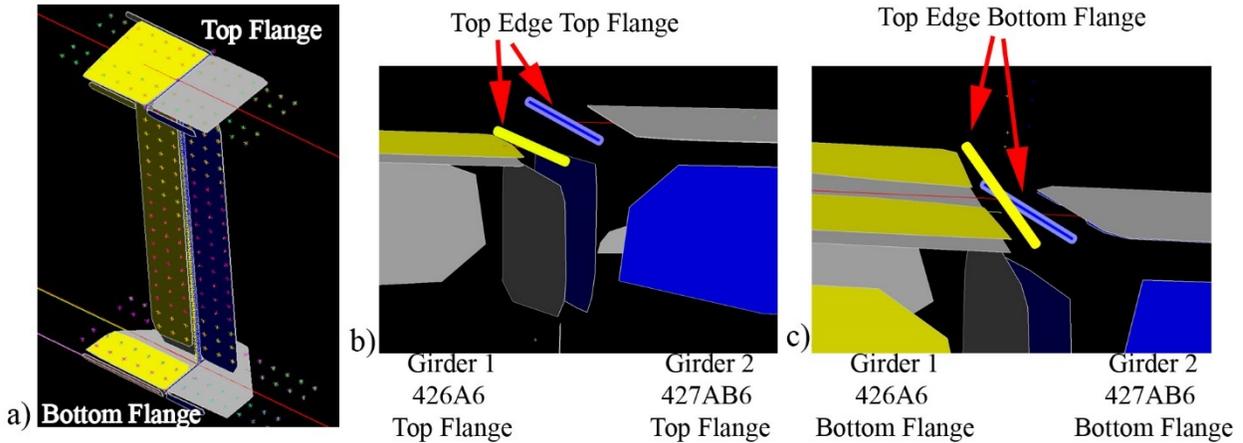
Virtual Assembly Fit-Up Details Showing a) a Splice and b) Close-Up of the Top Flange and c) Close-Up of the Bottom Flange
